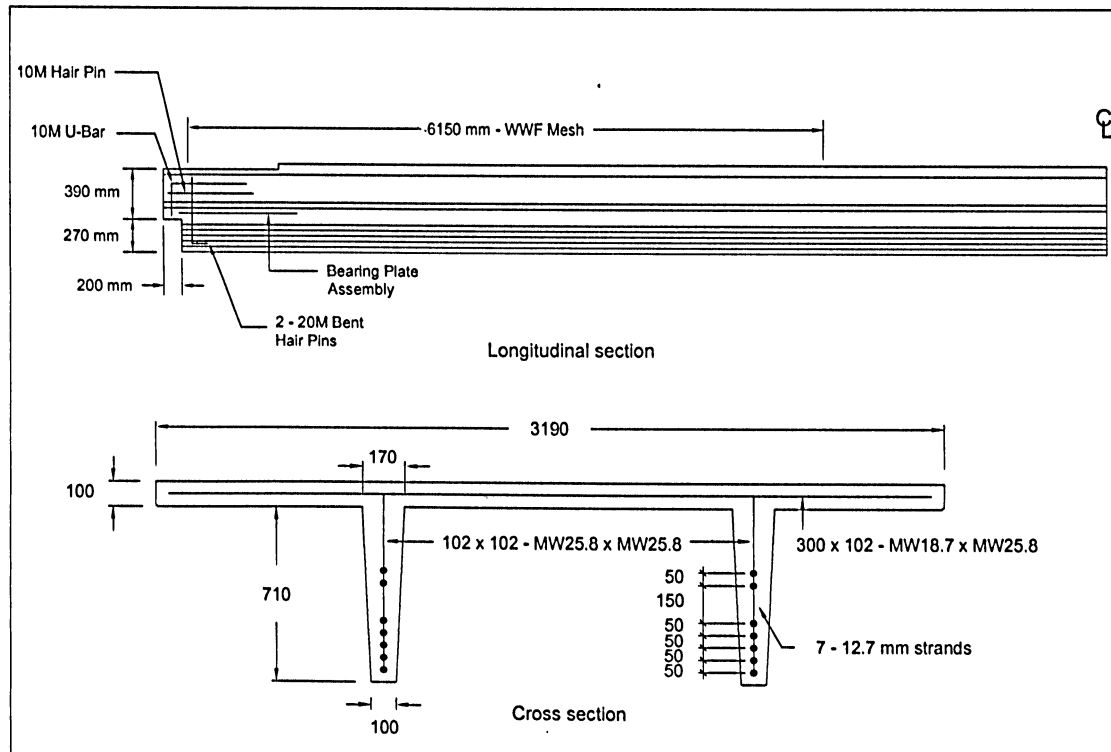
DT-41 girder reinforcement details (Cofini, 2005)
